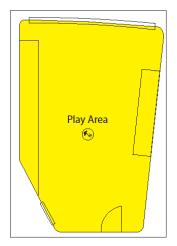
Levine 10th floor Play Room Plan. Not to scale.
